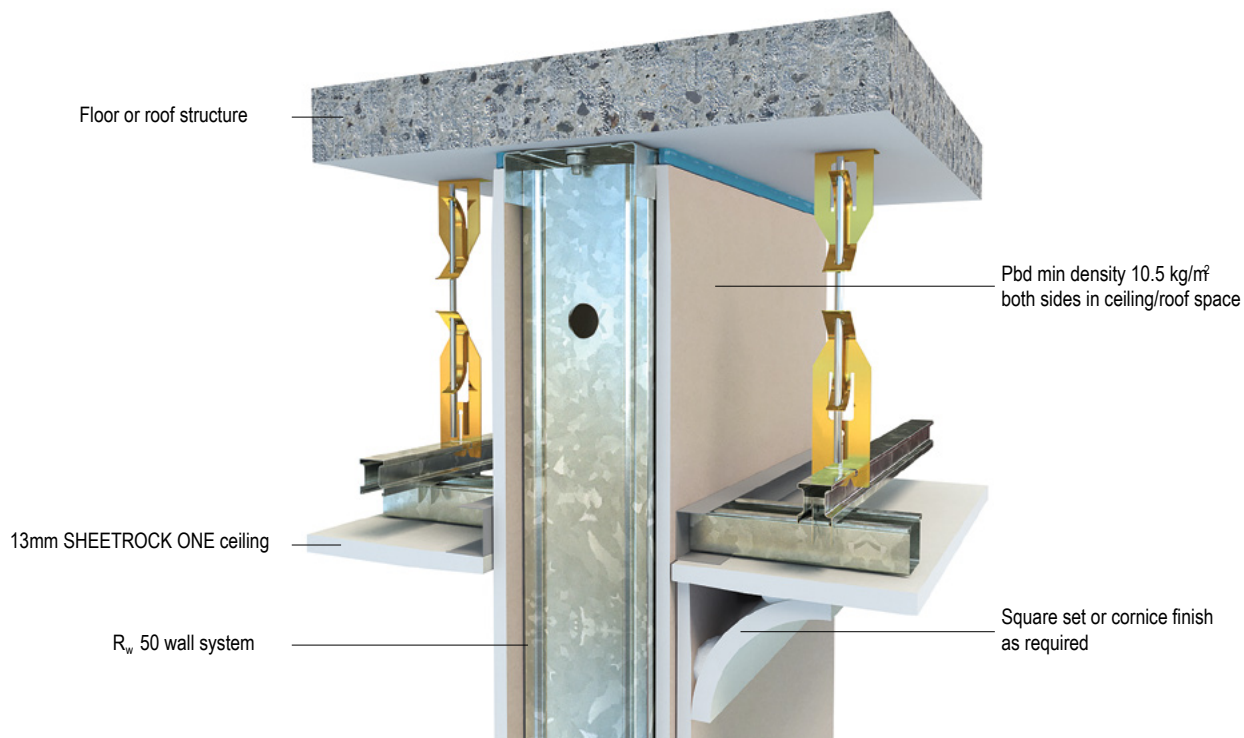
Ceiling configuration to maintain an R_w 50 wall acoustic rating (System OP.10 shown)
